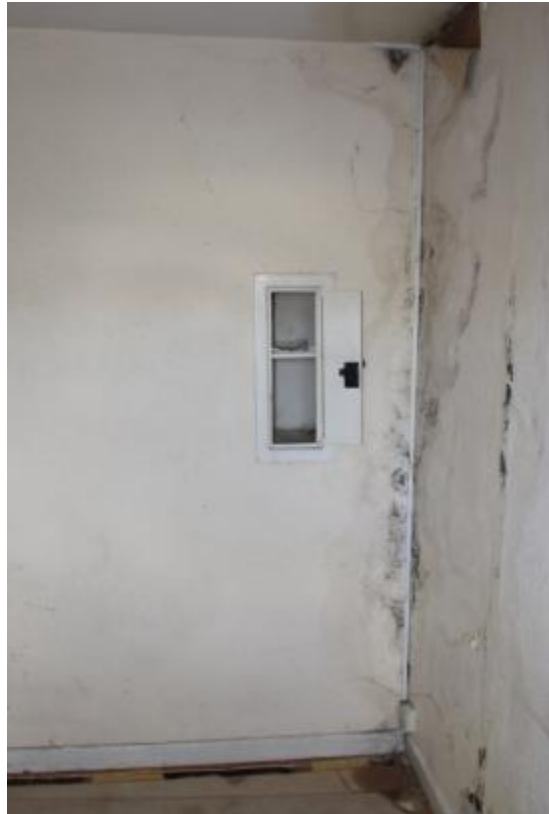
Viewing south towards small cupboard with splayed interior on thick dividing wall of No. 6 Castle terrace suggesting the exterior opening of a medieval window light
